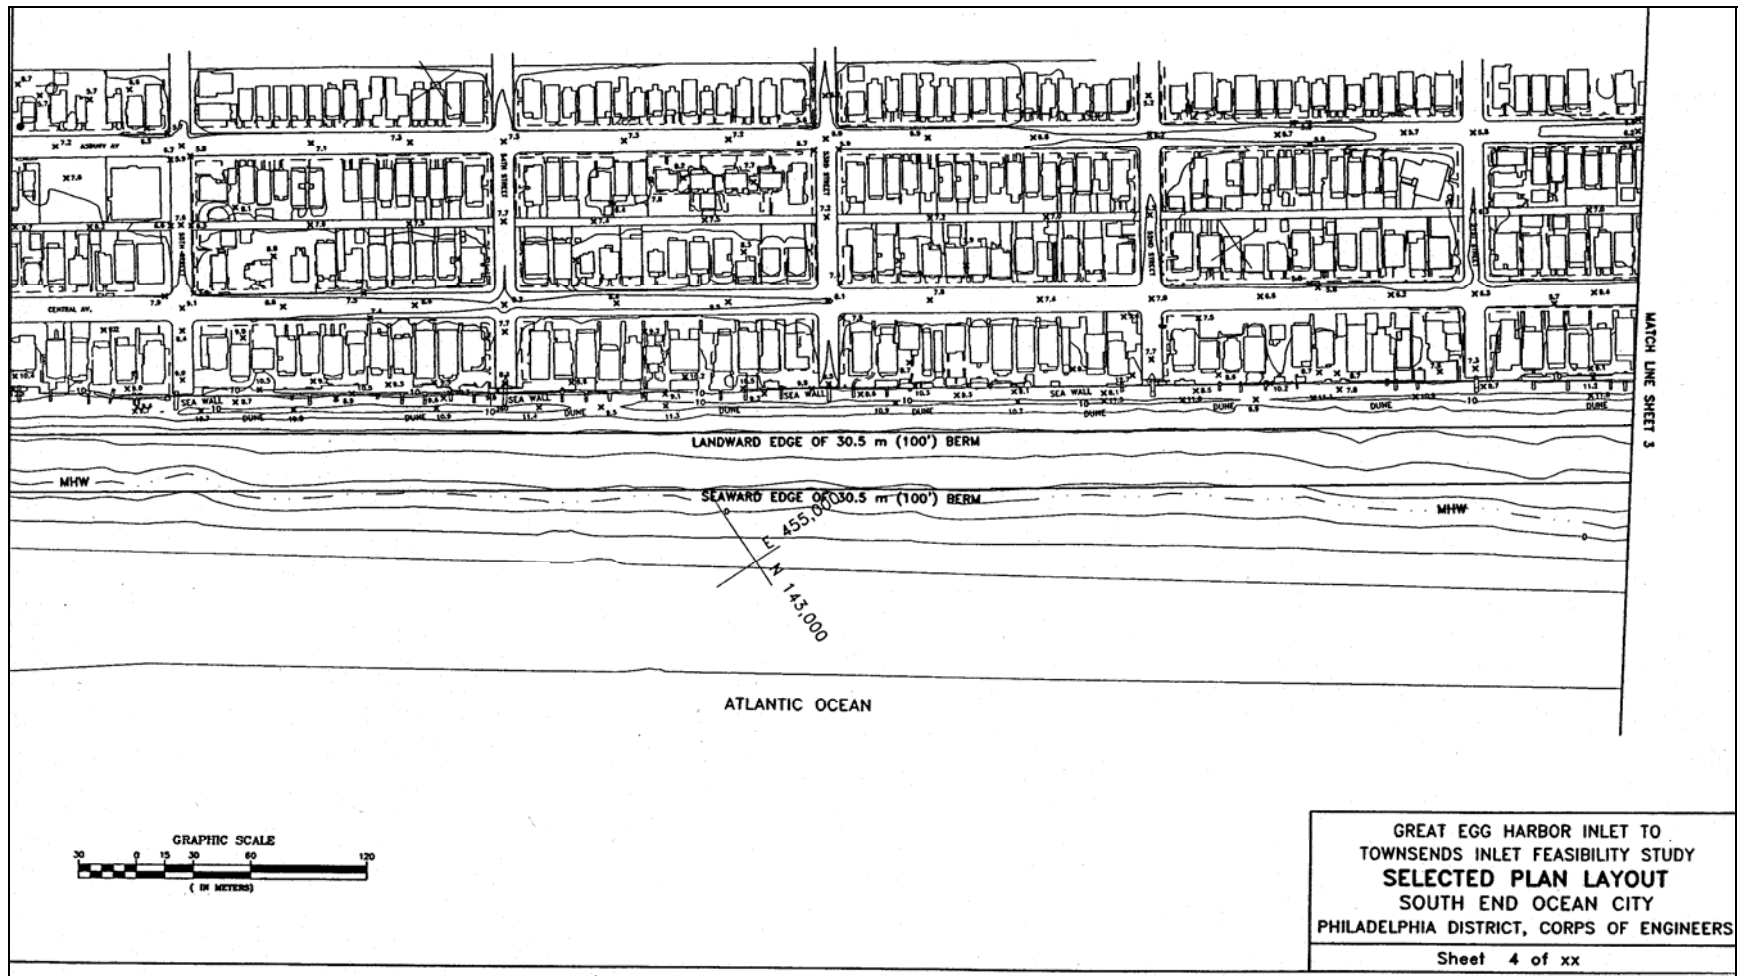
Selected Plan Layout for Ocean City, NJ – South of 50th Street to south of 55th Street
